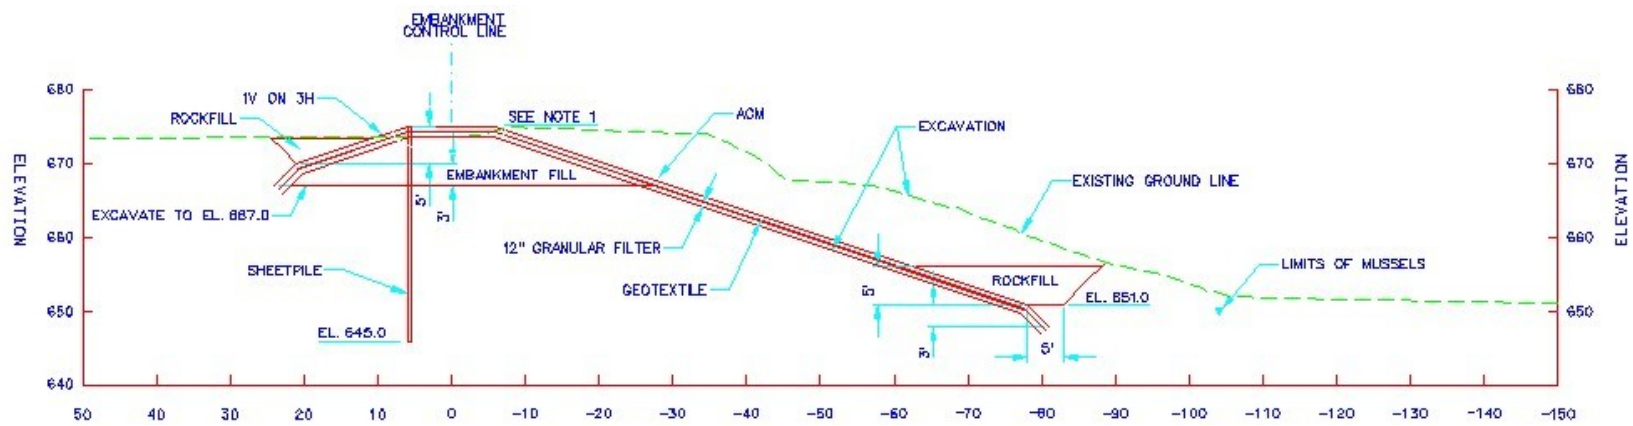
Cross section drawing of Marsh and Gantenbein Lakes spillways with articulated concrete mat (ACM).
